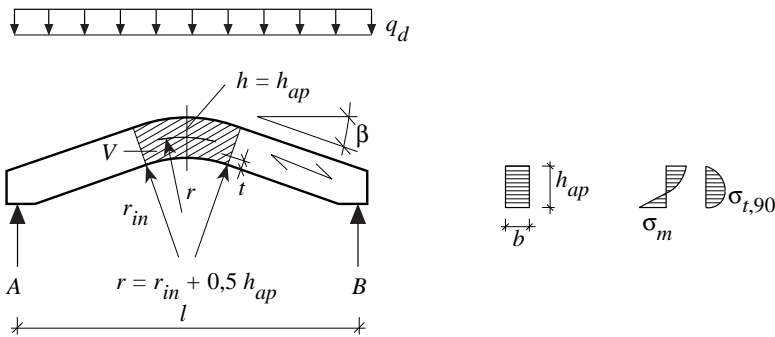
Geometric details and stress distribution at apex for curved beams of constant cross-section subject to uniformly distributed load. (STEP 1995 Article B8)
